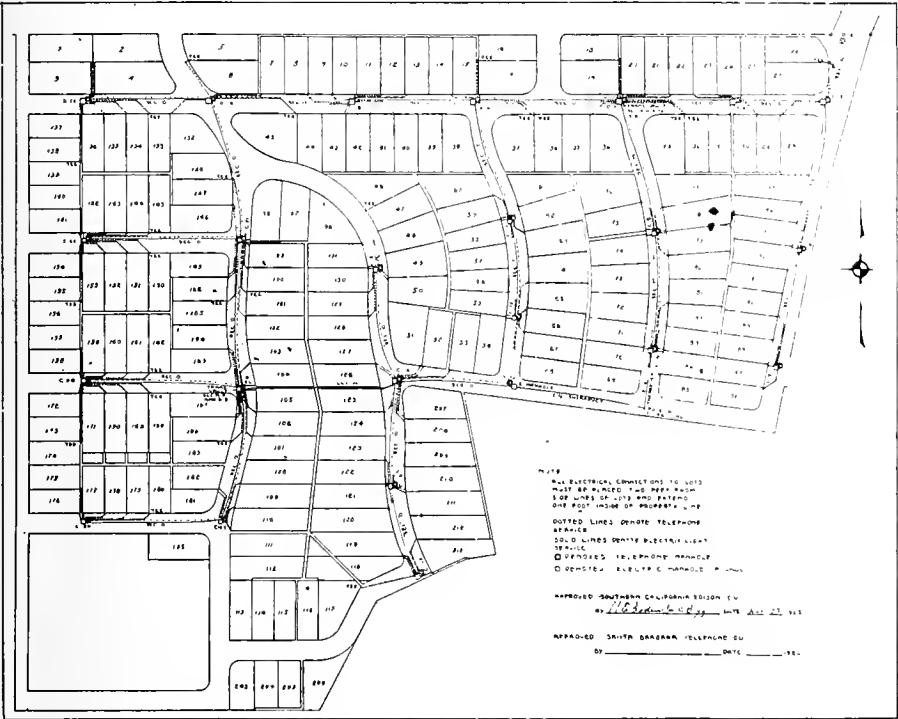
Thact map of the Samarkand Hills subdivision in Santa Barbara, showing the layout of hanholes and conduits to serve each lot with electric and telephone service through an extensive underground system.
